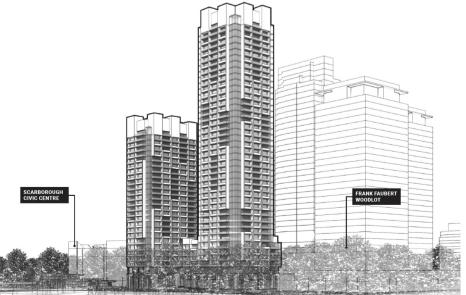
Proposed residential buildings at 158 Borough Drive. (Schmitt, 2021)
